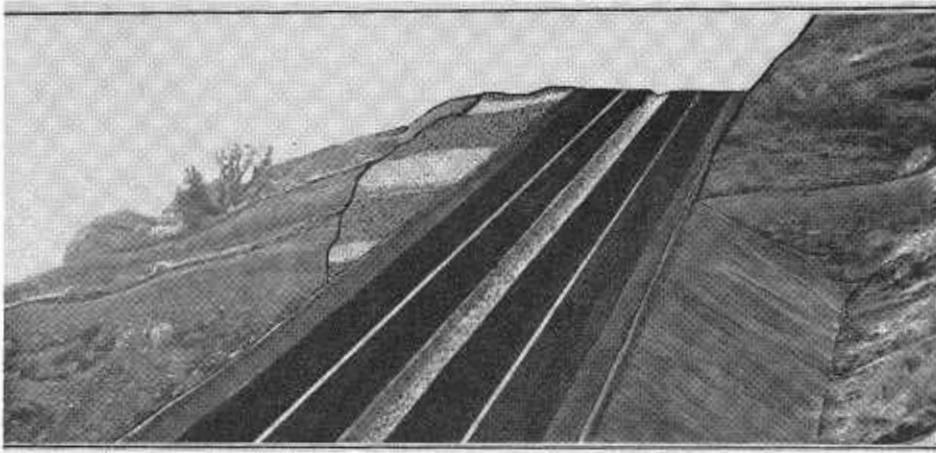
A sketch showing proposed excavation in a sandstone conglomerate bed.
